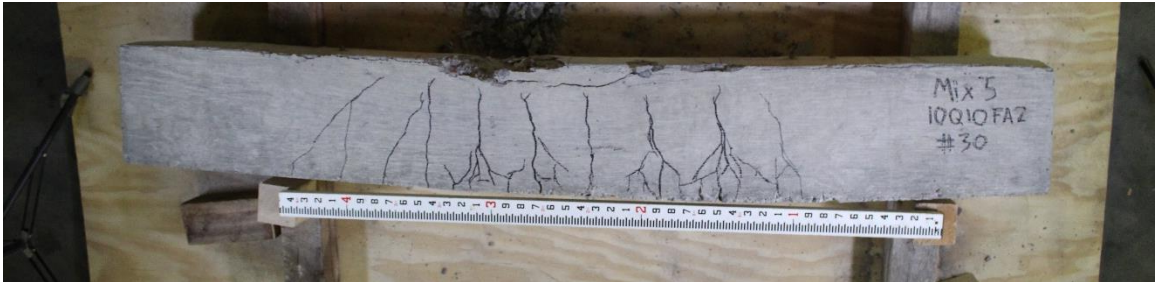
Mixture 5 (10Q10FA2) beam #30: concrete beam side view.
